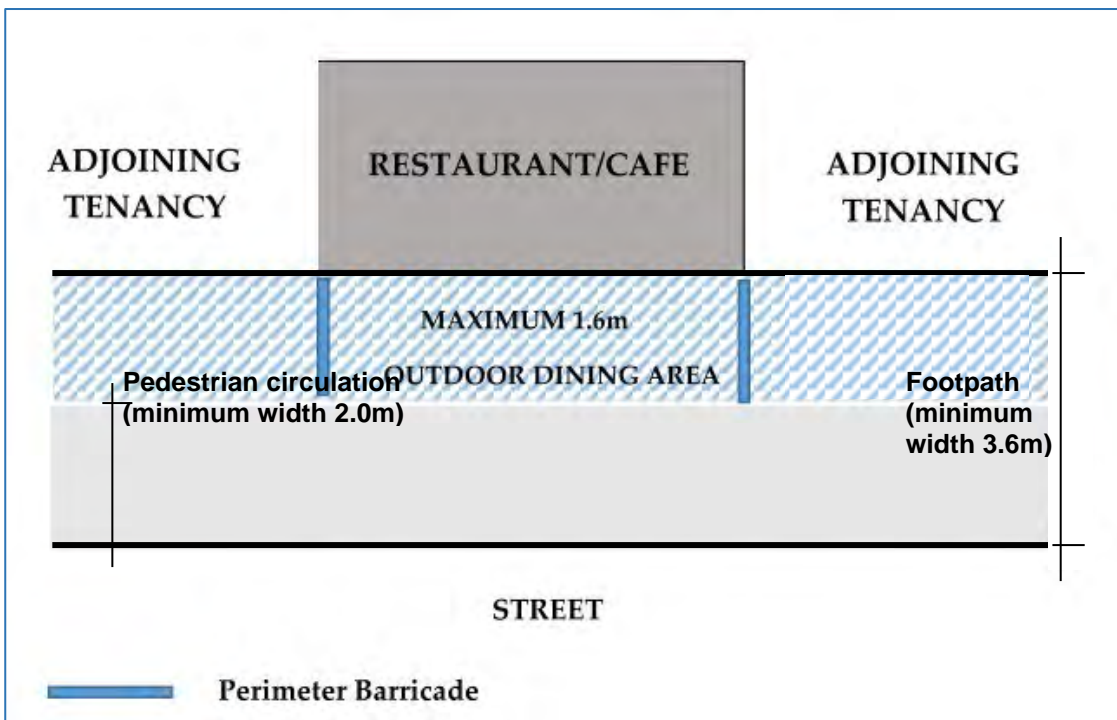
Dimensions for outdoor dining for all other locations with or without parking adjoining
